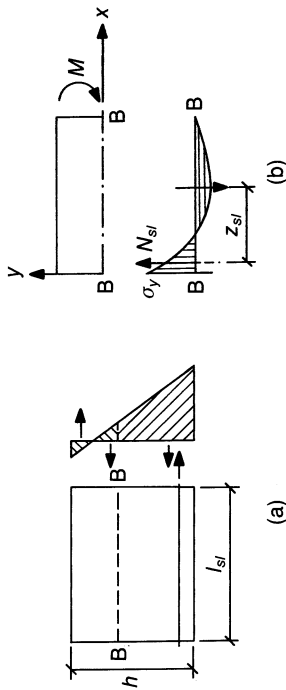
For calculation of the spalling force: (a) definition of the equivalent prism; (b) moment equilibrium along section B-B
